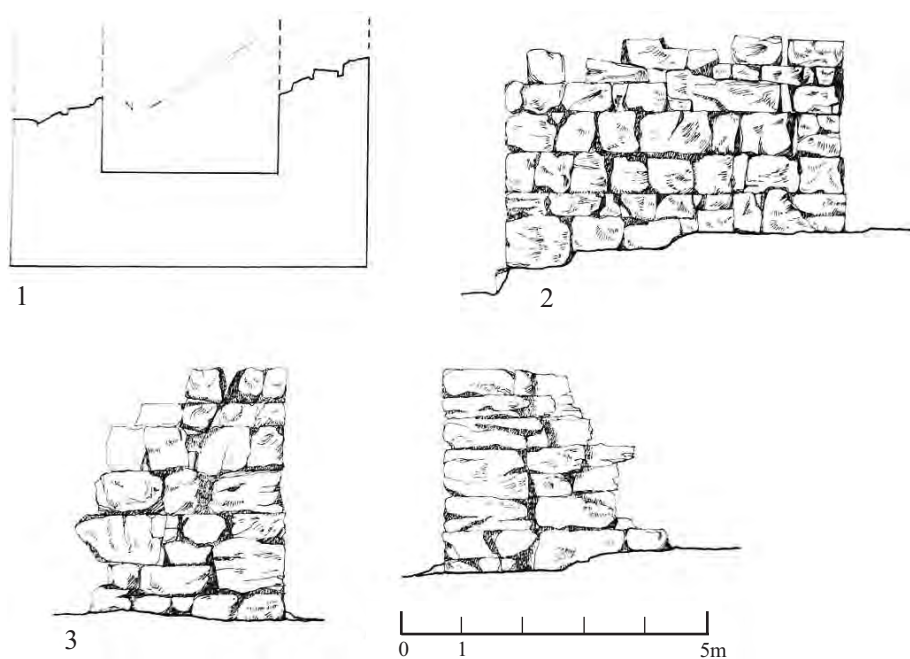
Ruins of one of the towers, village of Kushkhevi, Georgia, 2014. Plan: (1) a fragment of the western wall, (2) a fragment of the northern wall, (3) remains of the southern wall (drawing G. Kipiani).
